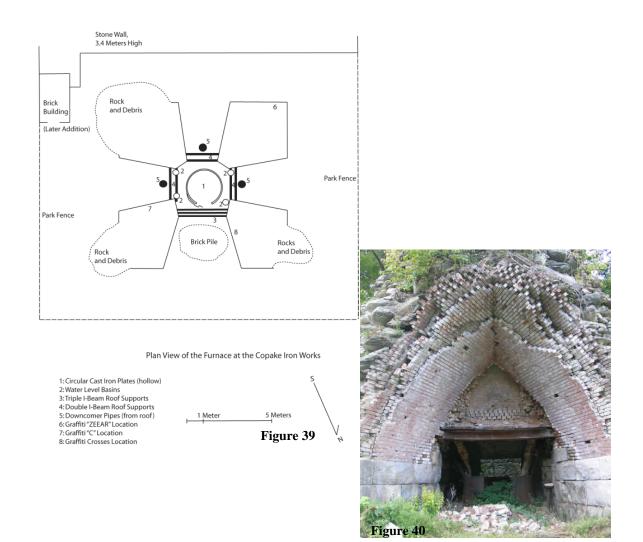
Plan of furnace stack ruins. Note the downcomer pipes and I-beam supports are from the ceilings of the arches and not from the bottom.
